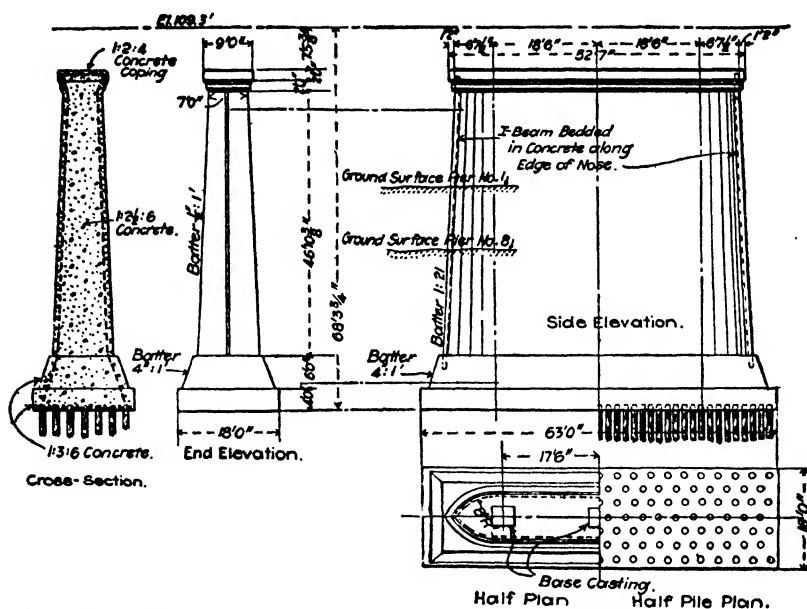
General Dimensions of Piers of Illinois Central Railroad Bridge over Tennessee River, Gilbertville, Ky.
